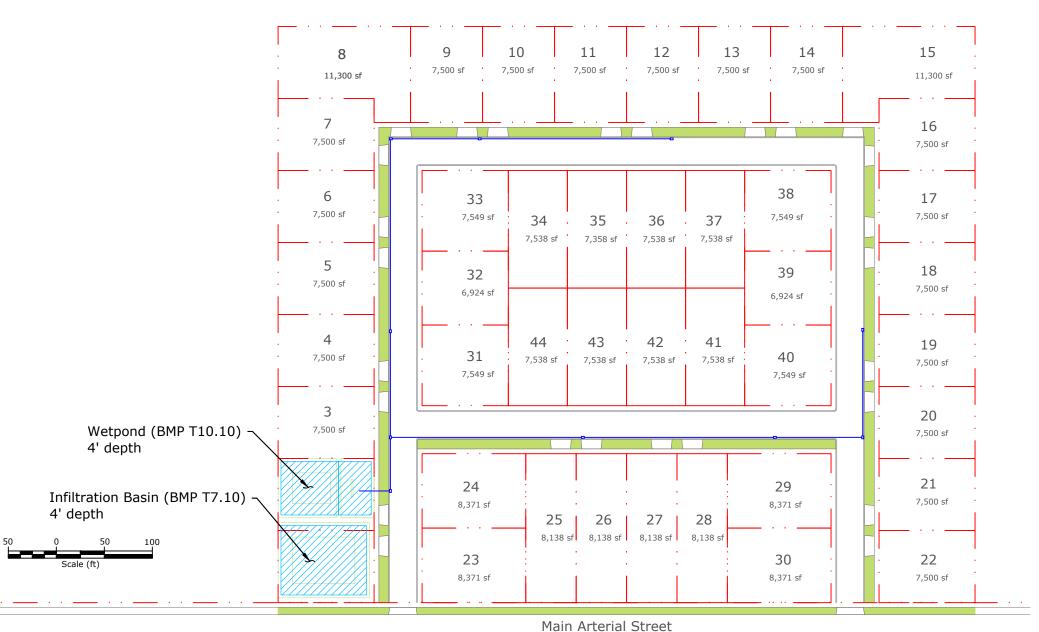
Scenario 1. Permanent Stormwater Site Plan – Typical Single-Family Residential Development, 2005 Requirements, Outwash Soils
